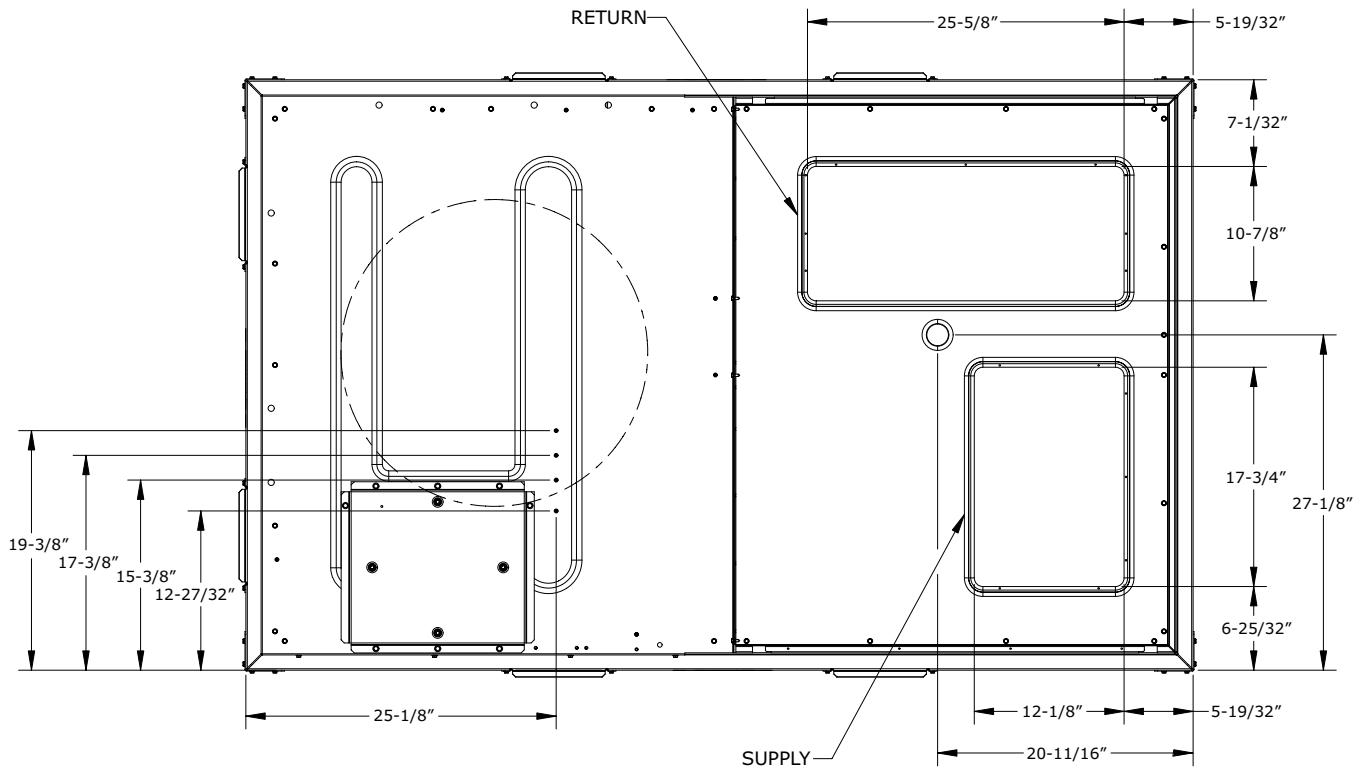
Cooling with optional electrical heat and gas/electric units — back view (horizontal configuration)
